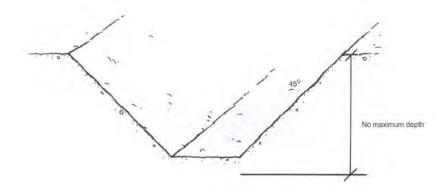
Cut back of excavation walls in "likely to crack or crumble soil"
